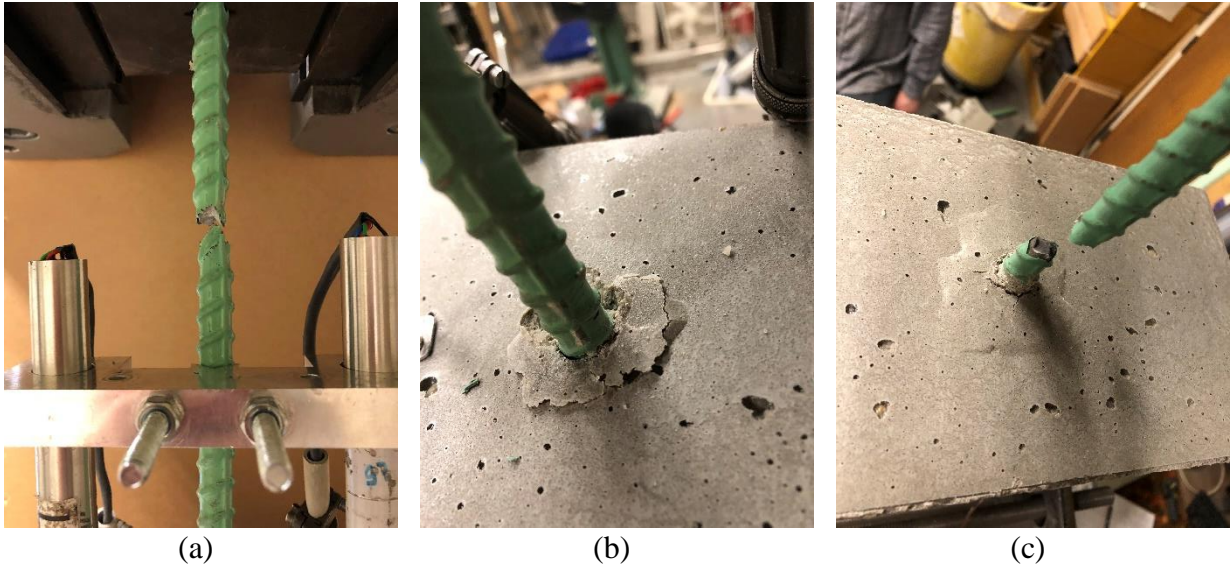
(a) Elevation view of bar fracture, 1-02, (b) Rebar at top of HCSC, 1-02, (c) Bar fracture and top of HCSC, 1-04
